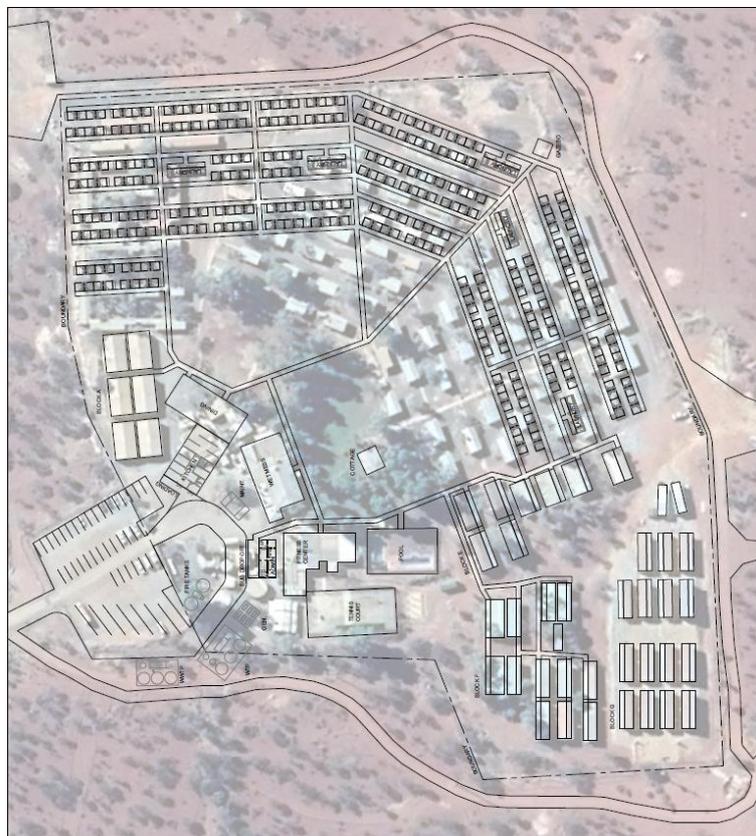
Plan View of Previous Proposed Expansion of the Wiluna Village
